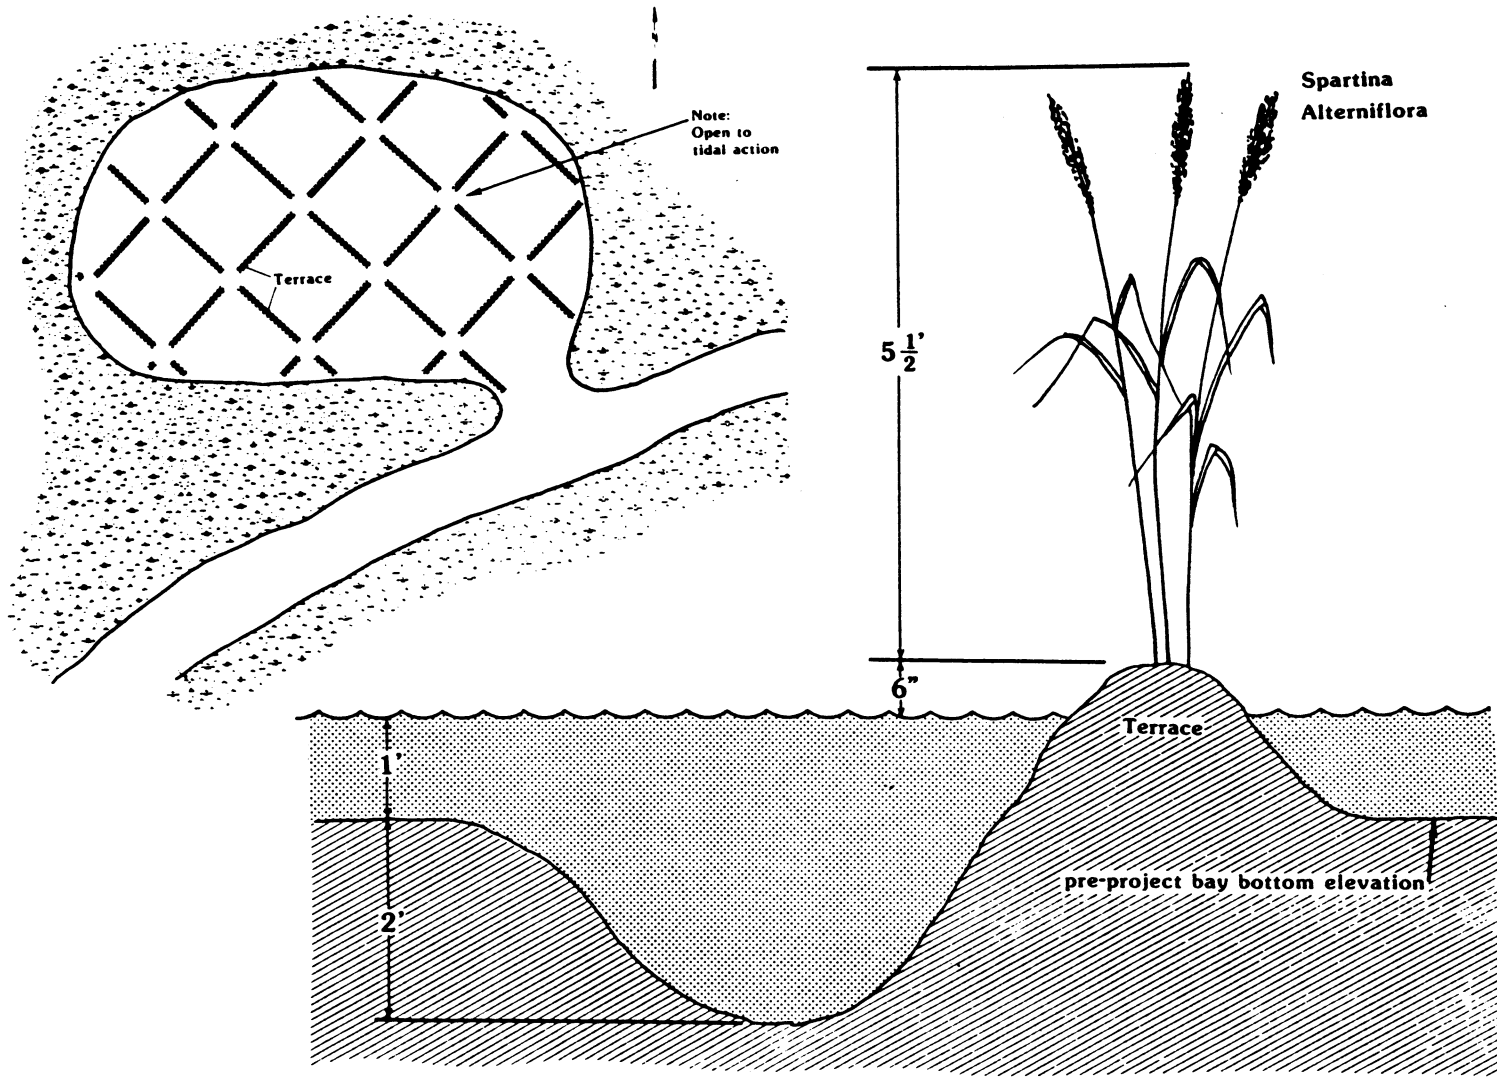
Conceptual cross-sectional and plan views of proposed bay-bottom terracing.
